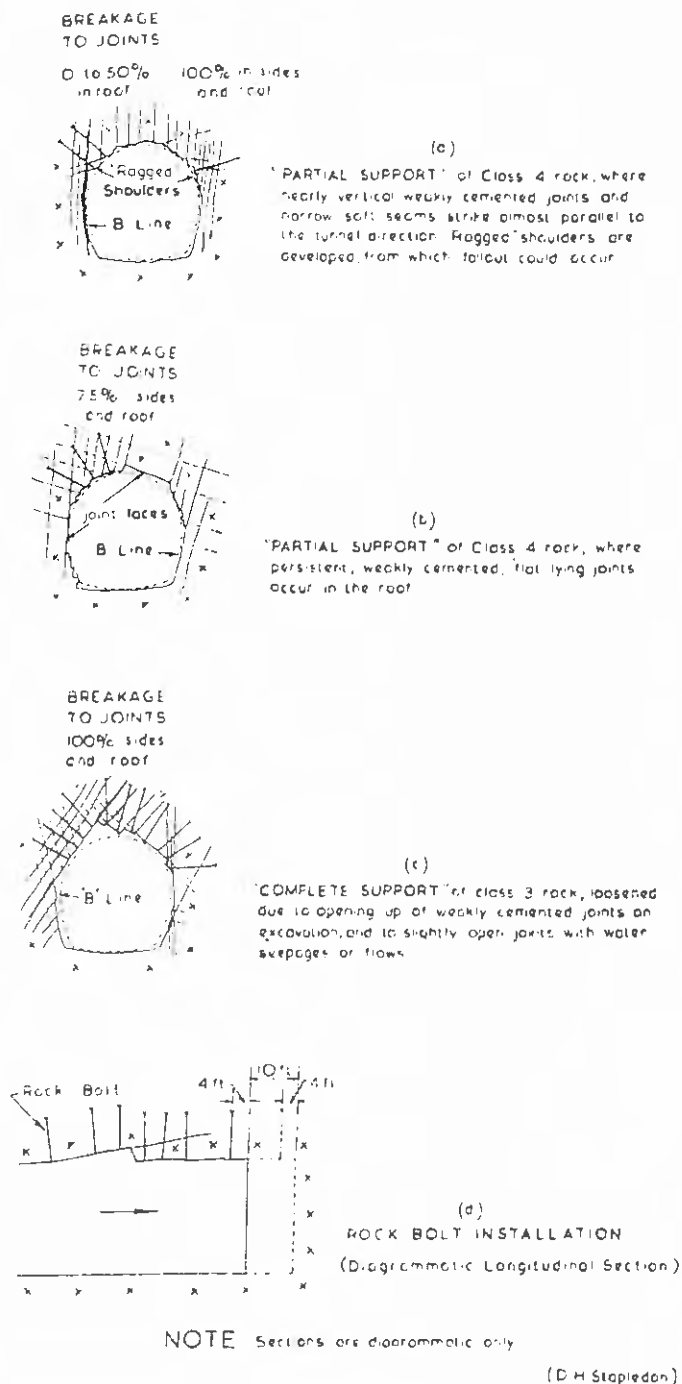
Tumut 2 Pressure Tunnel Typical Rock Bolt Installations.
